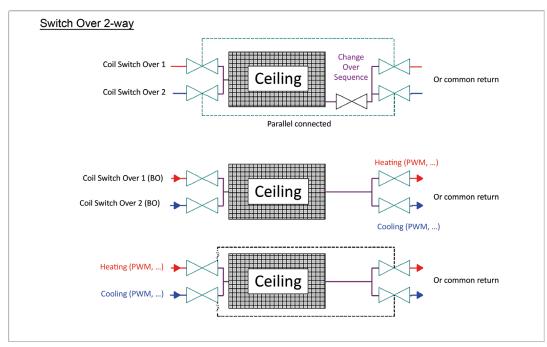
Ceiling Switch-Over Configuration with 2-way valve
